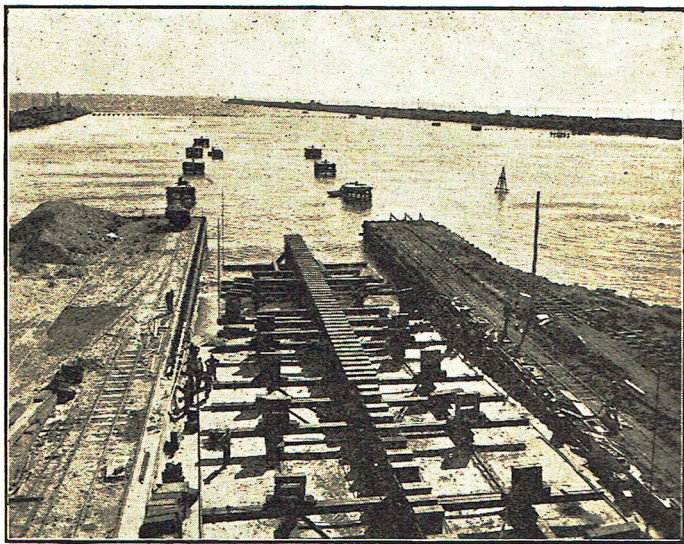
View looking West, Showing Cradle and Dolphins.
